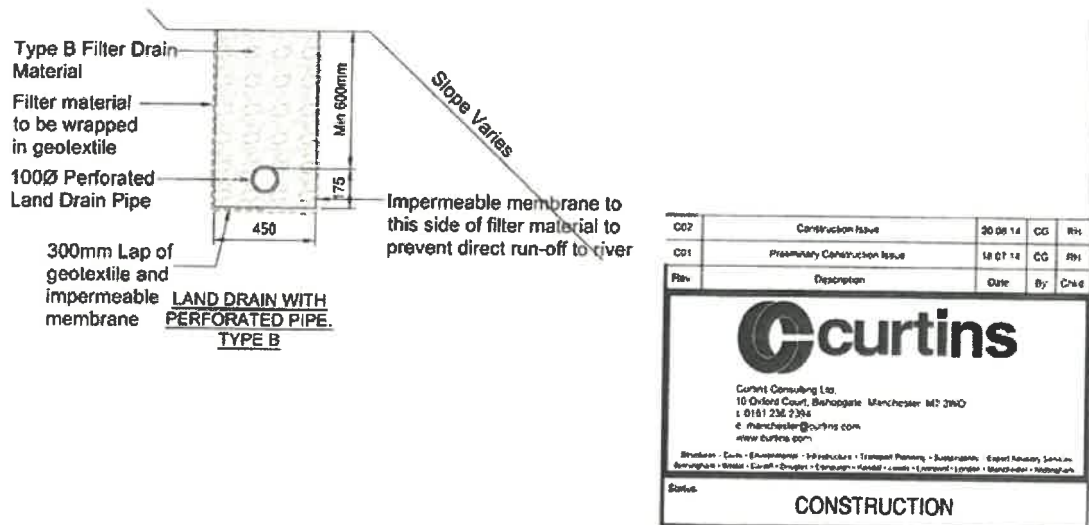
Part of Drainage drawing 501 rev C02.
